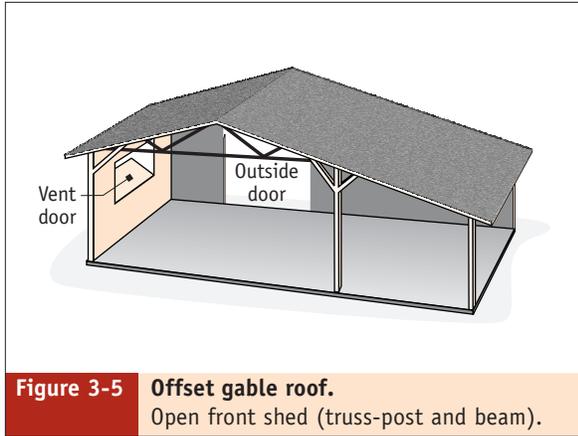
Offset gable roof. Open front shed (truss-post and beam).
